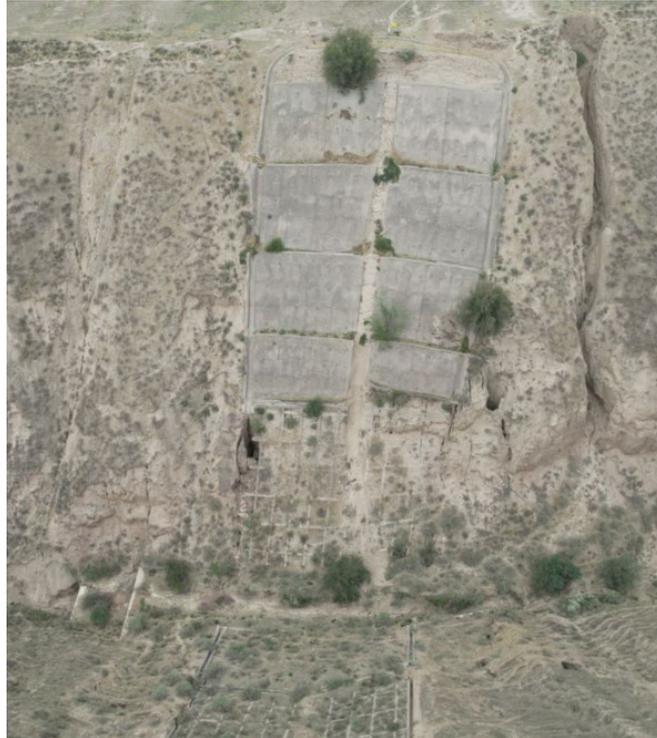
On-site effect diagram of anchor cable lattice protection + concrete slope protection + intercepting and drainage ditches set on both sides and top
